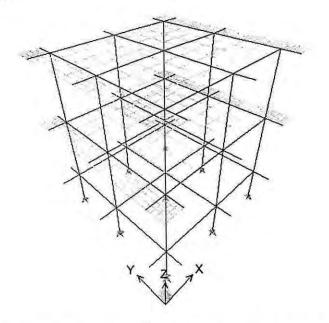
3D view of the FE model of a Type-J cyclone shelter (without bracing)
